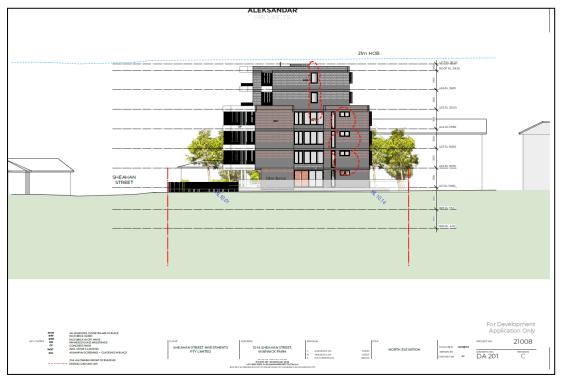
North Elevation Plan (Source: Aleksandar Projects)
